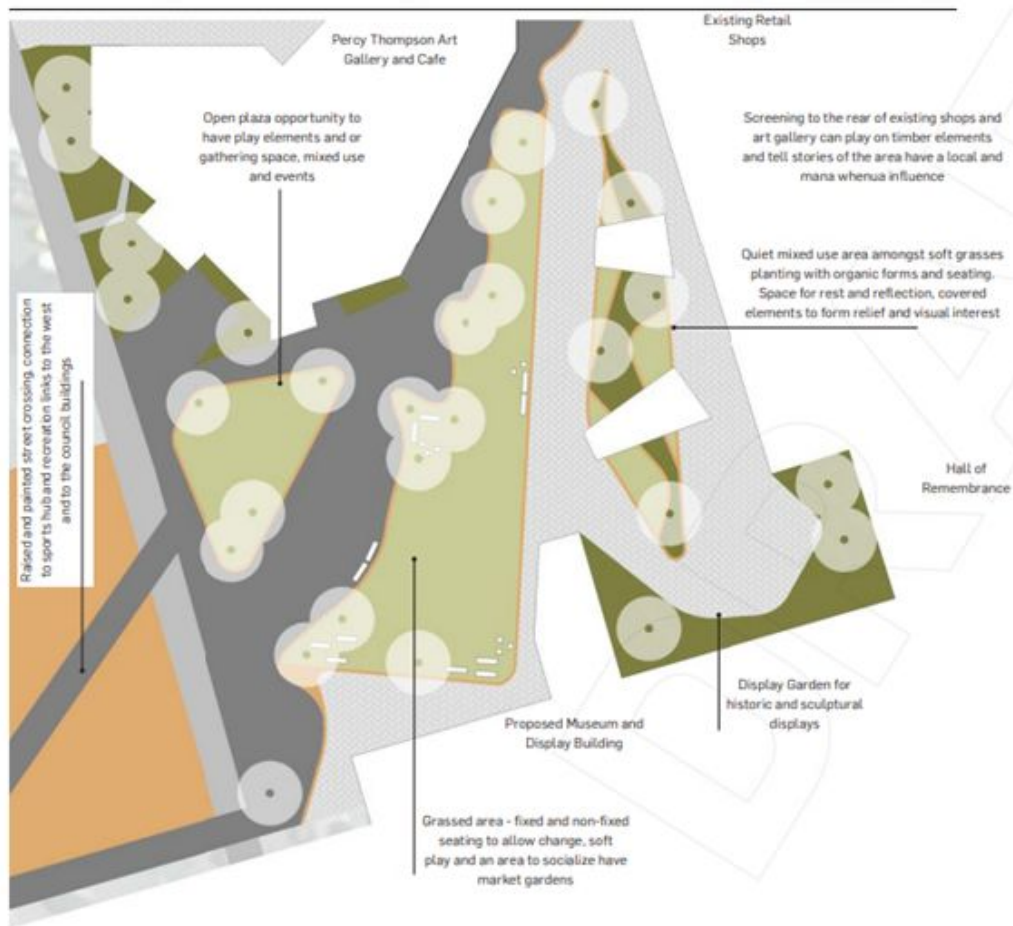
DGSE detailed concept plan for Prospero Place Southwest plaza.
